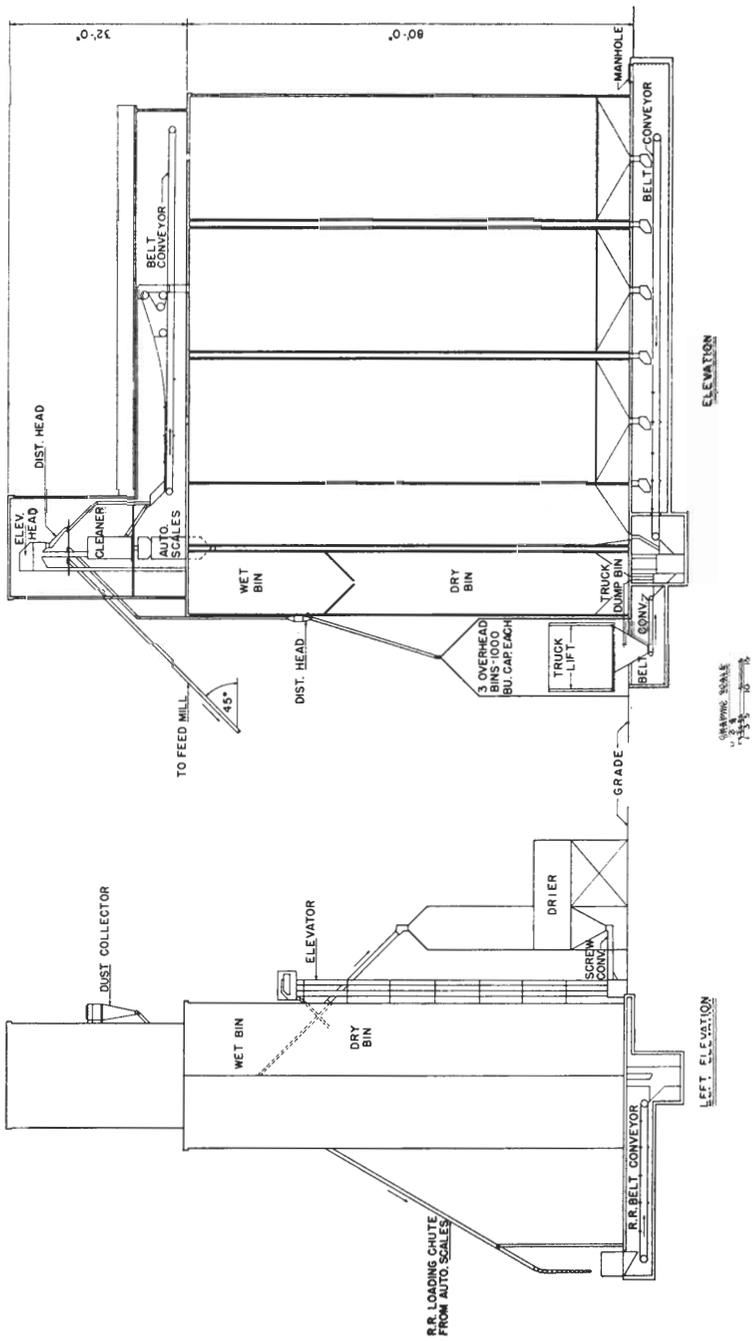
Schematic elevation of proposed plan described in Plant 4.
